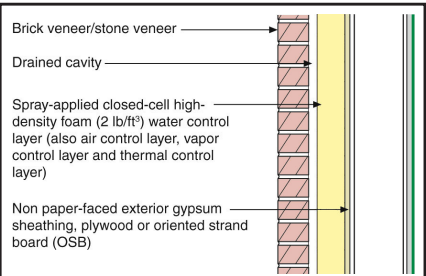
Exterior Rated Wall – High density closed cell spray foam with a 1 hour rating – UL – System No. EWS0015. It can be constructed with a brick veneer, stone veneer, terracotta cladding and stucco.
